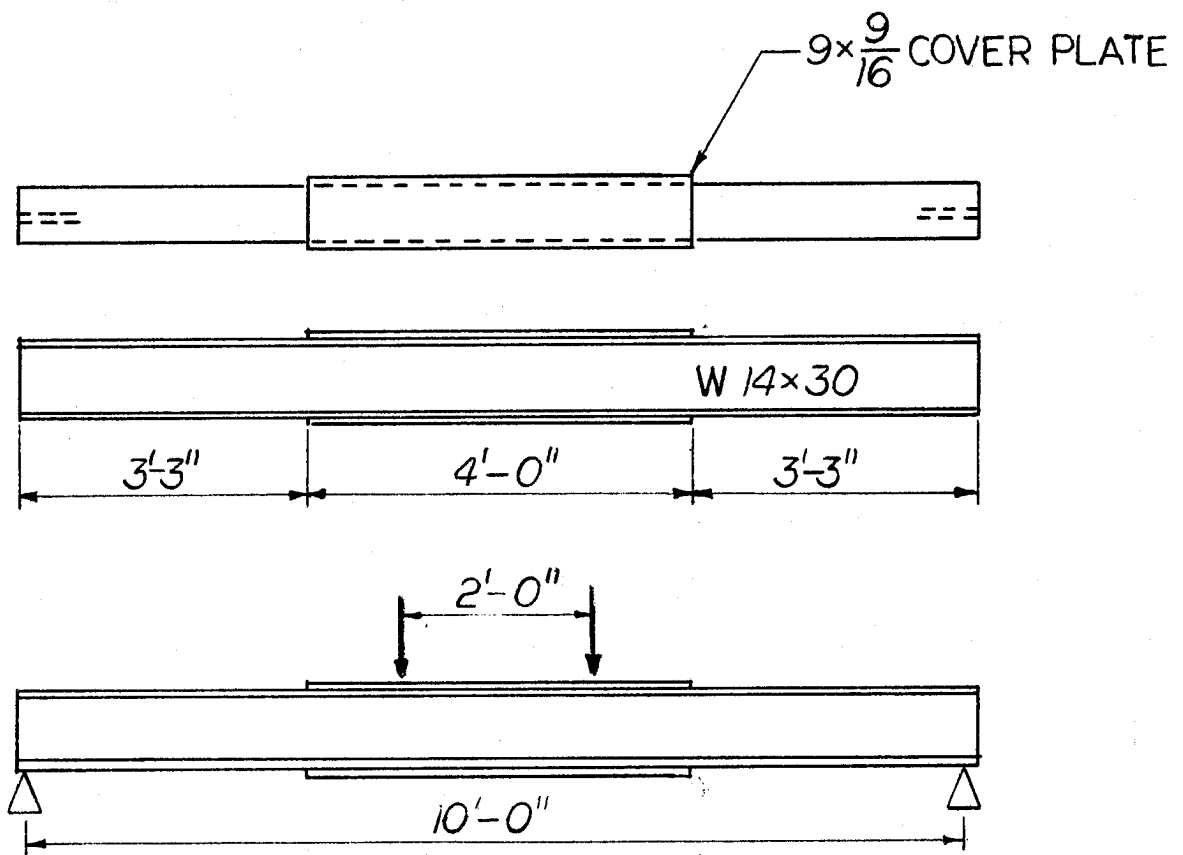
LARGE SCALE FATIGUE SPECIMEN
